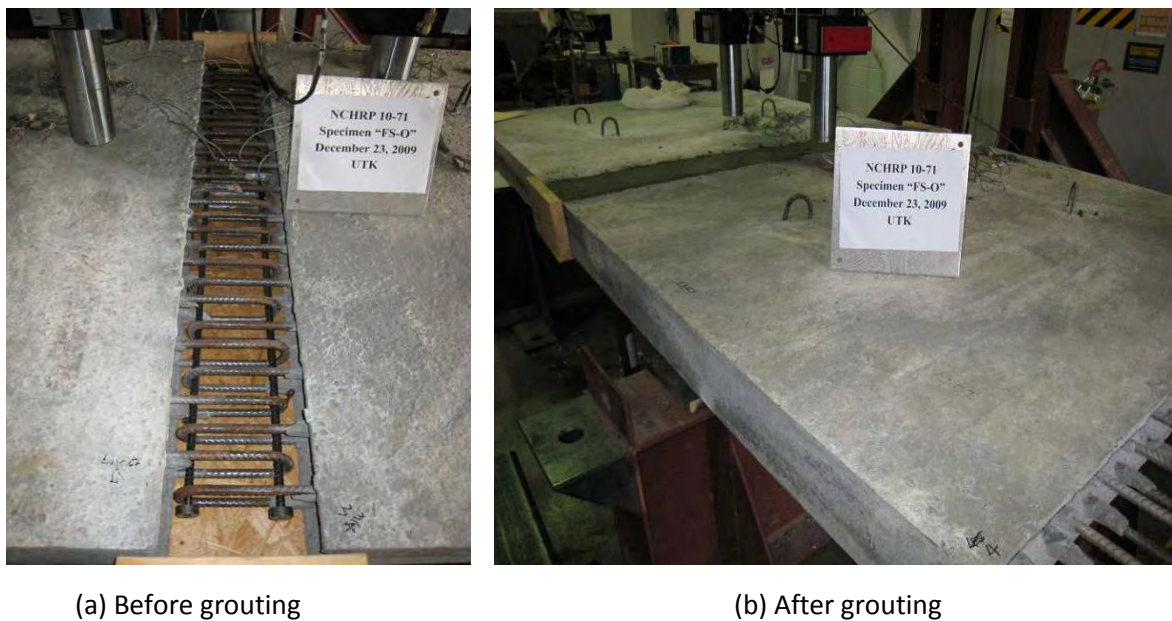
Longitudinal joint specimen before and after grouting
